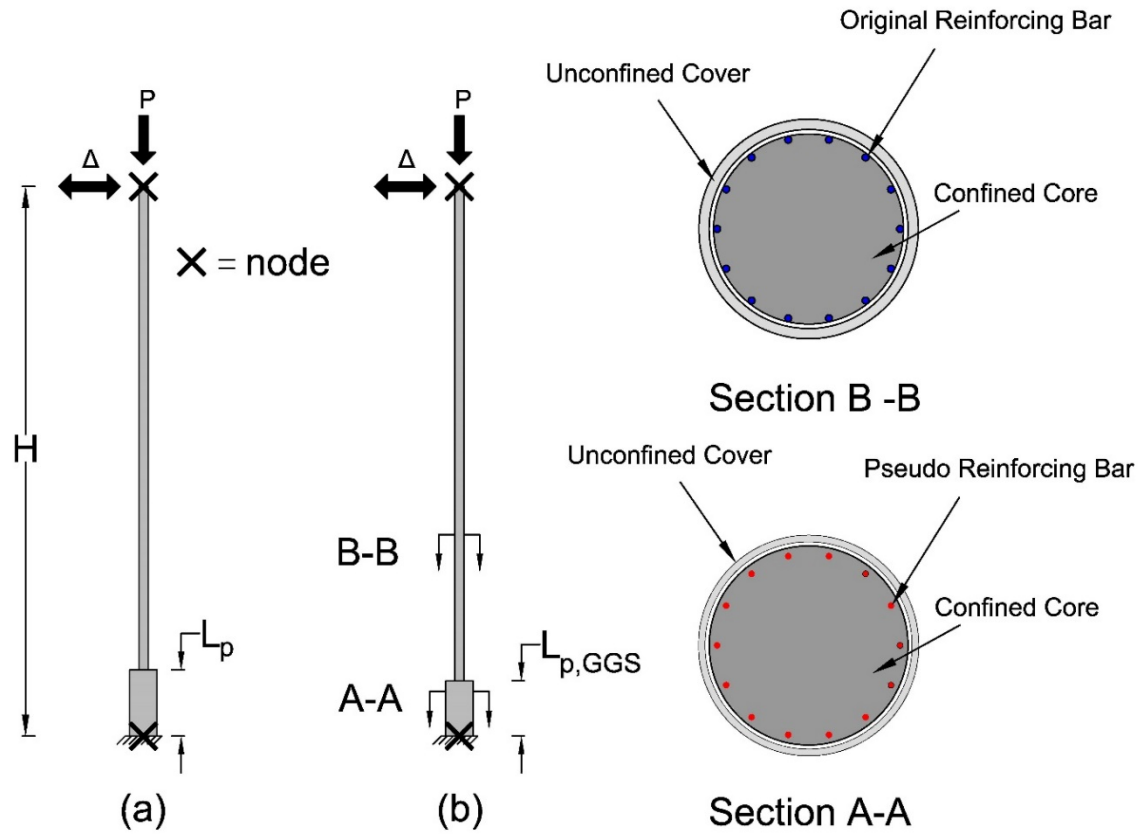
Example of column model layout: (a) column model 9 (CIP); (b) column model 10 (Precast-2).
